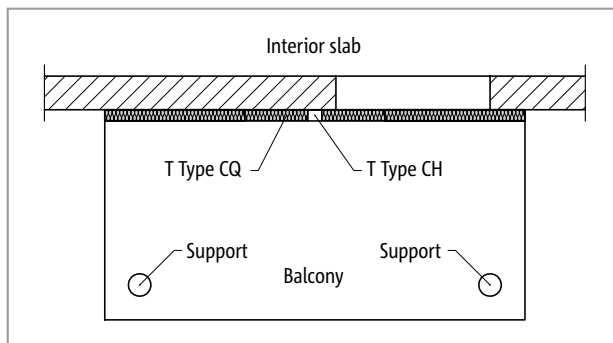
Schöck Isokorb® T Type CQ: Balcony with column support
